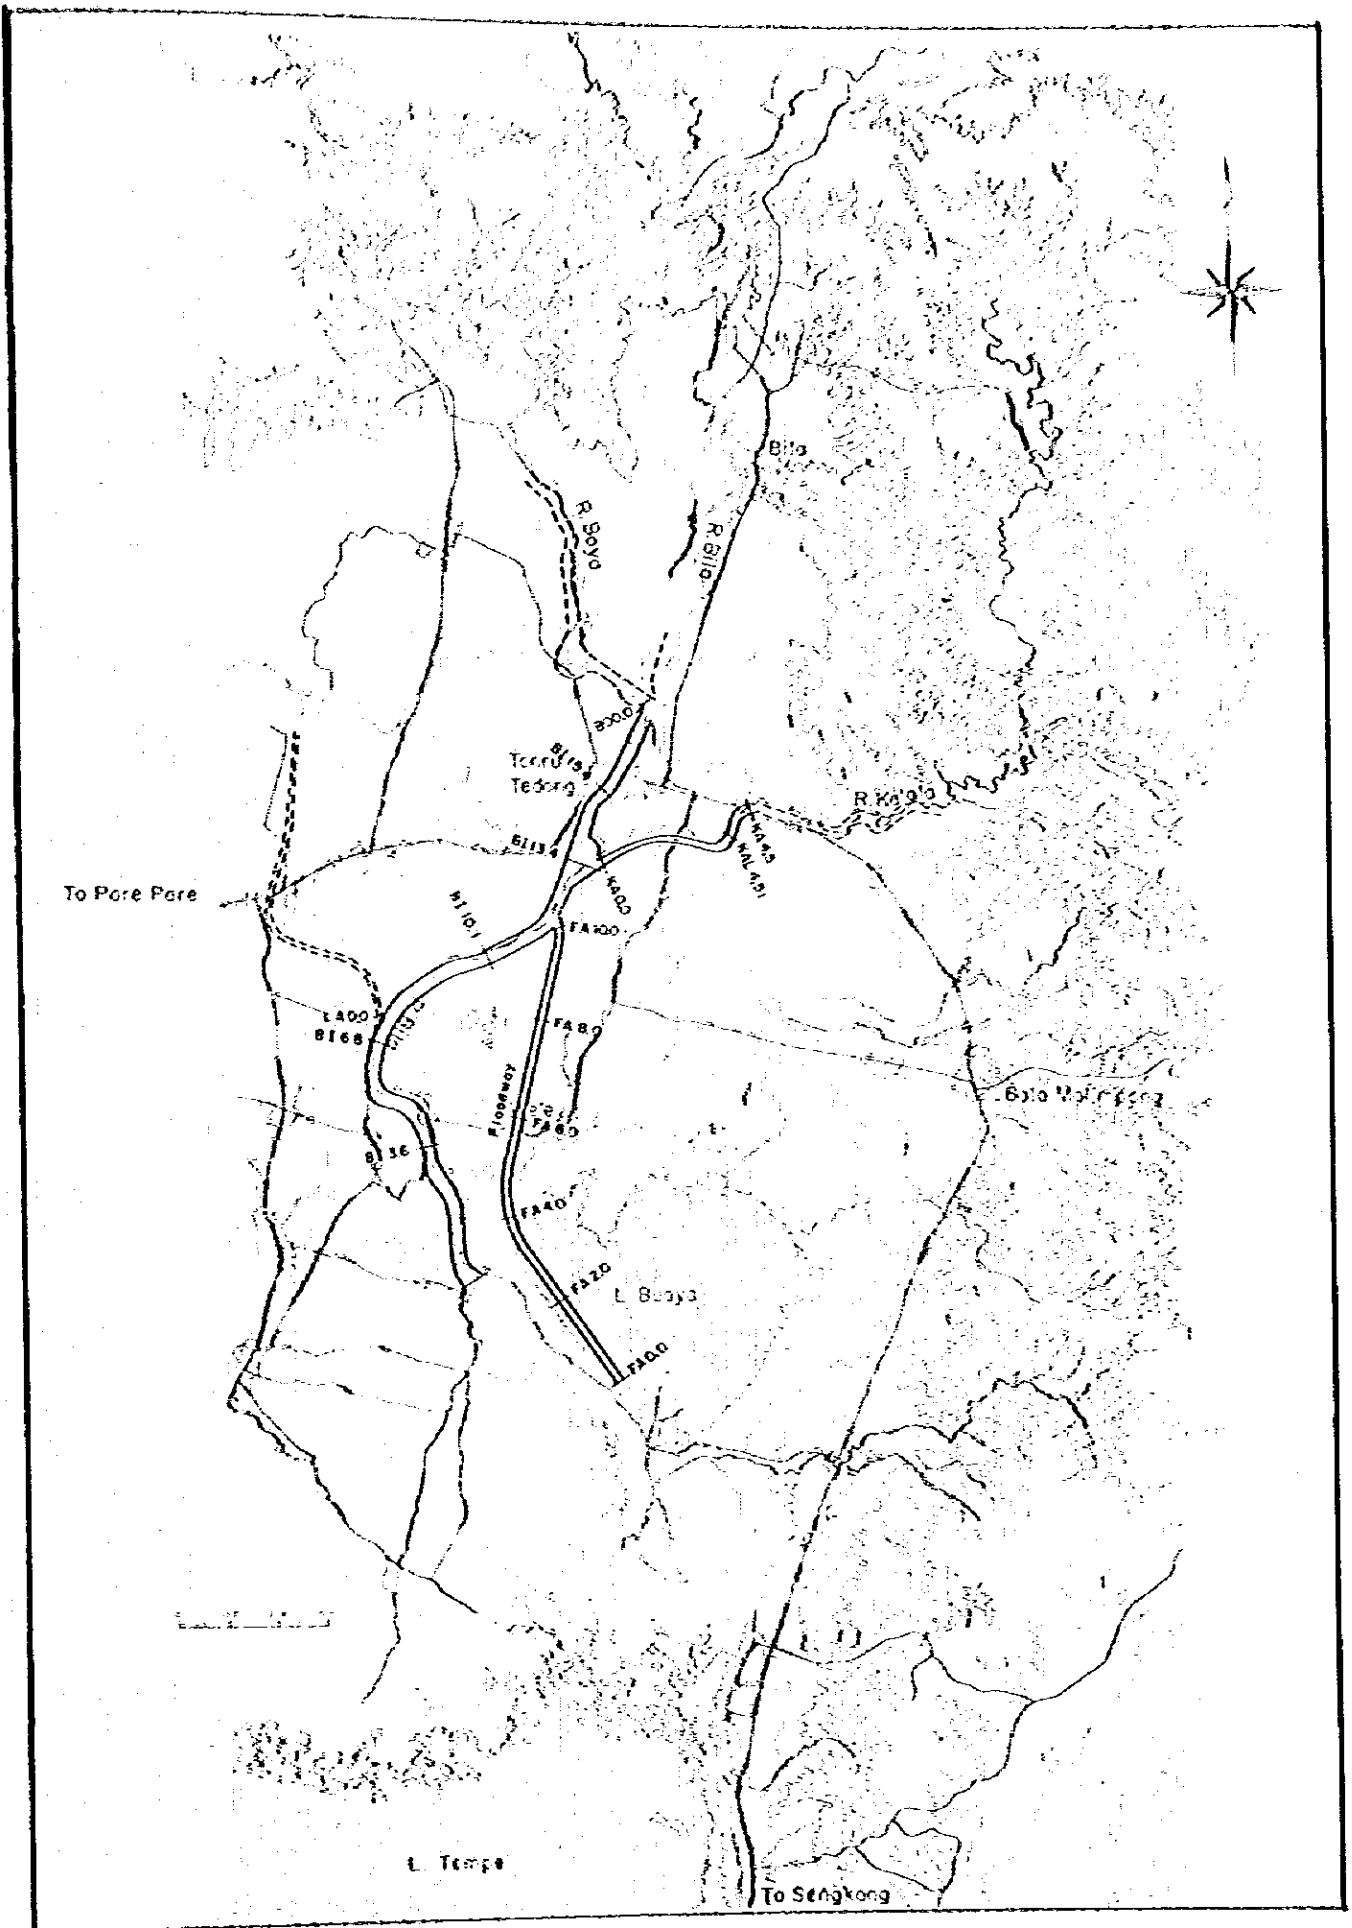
PLAN 4 (CONSTRUCTION OF FLOODWAY ALONG THE ATE DRAINAGE CHANNEL)
